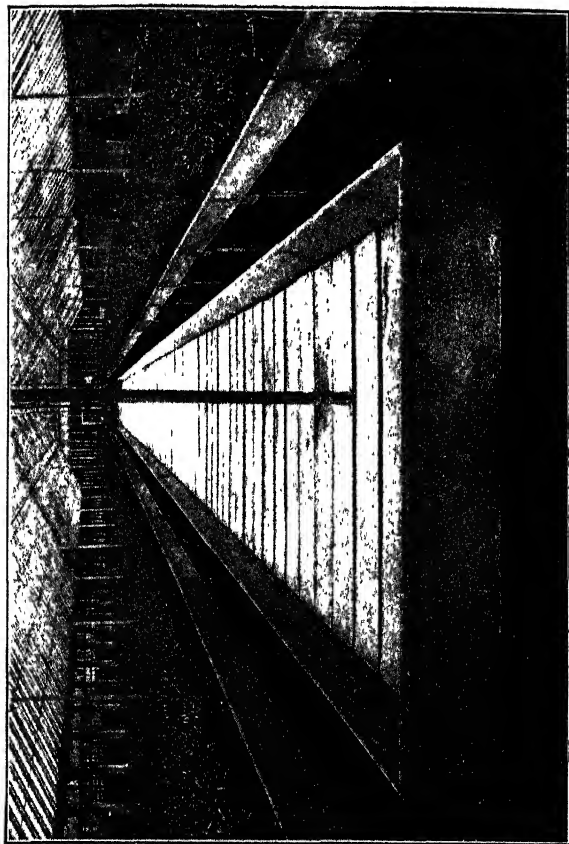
Greenhouse bench of concrete. The bottom is made of slabs of concrete.
